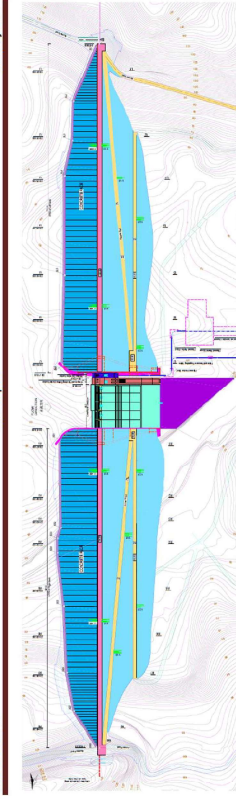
General Layout of Complex Works of Combination of CFRD Sections and Concrete Gravity Dam Section
